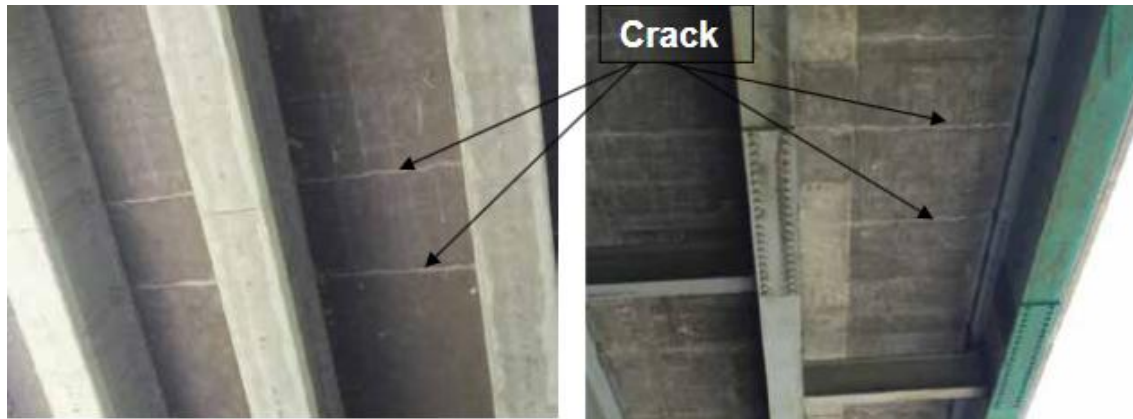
A concrete bridge sample, transverse fissures on the left side, compared to those in steel girder bridge on right photo [30]
